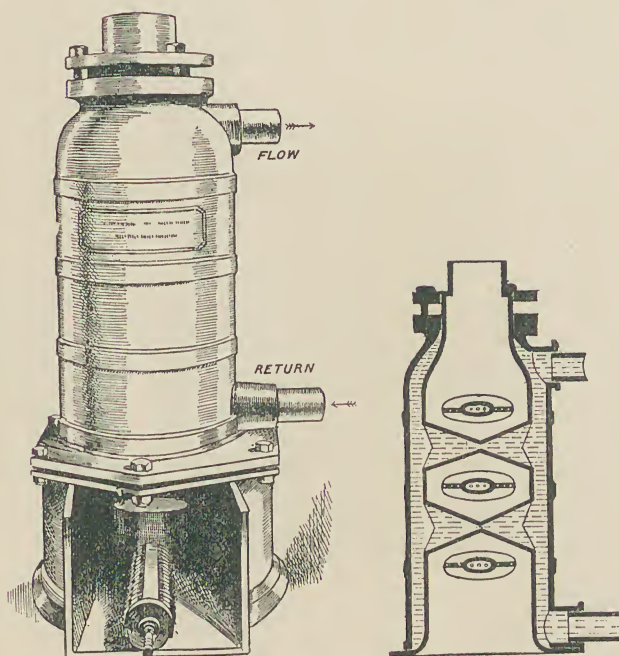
View and Section of Fletcher, Russell, & Co.'s Cross-tube Gas Boiler.
